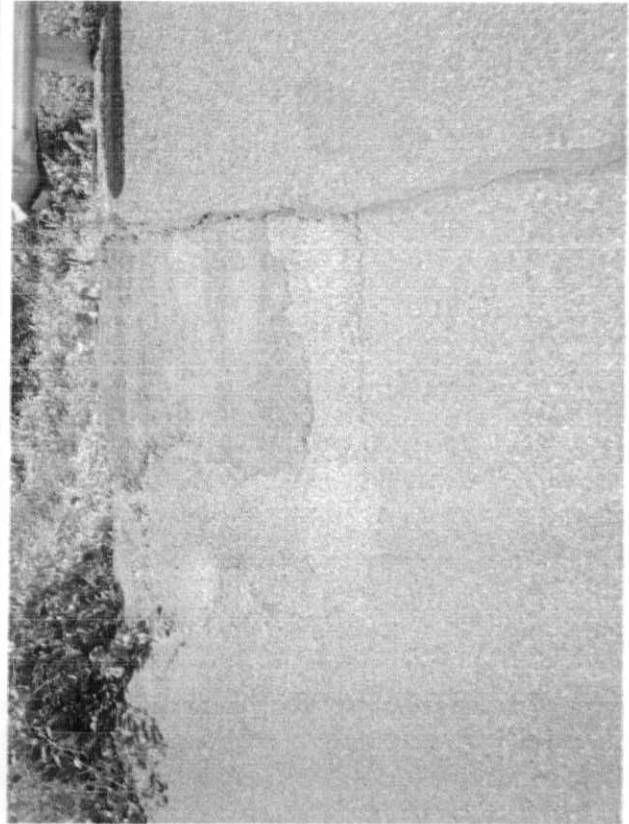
Bituminous concrete patch repair in approach pavement over void in south abutment stem
